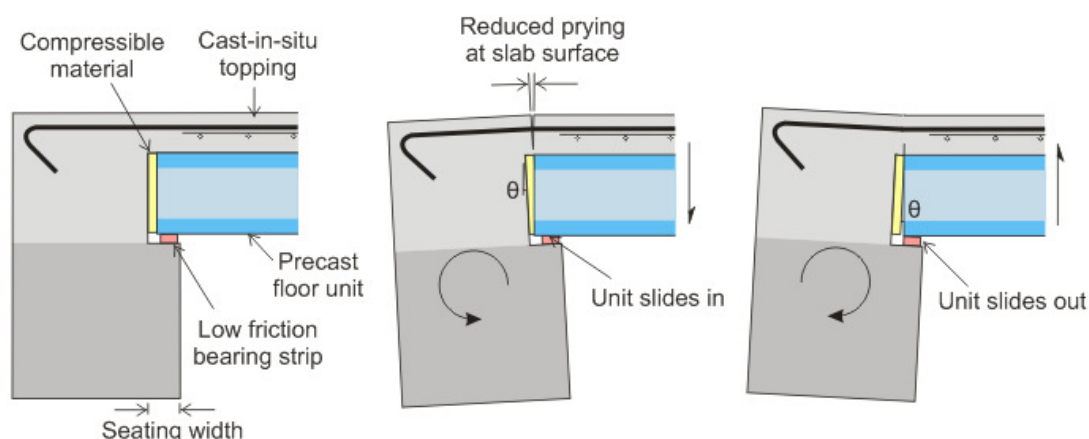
Recommended precast floor unit seating detail to reduce prying at slab surface (Matthews et al., 2003)
